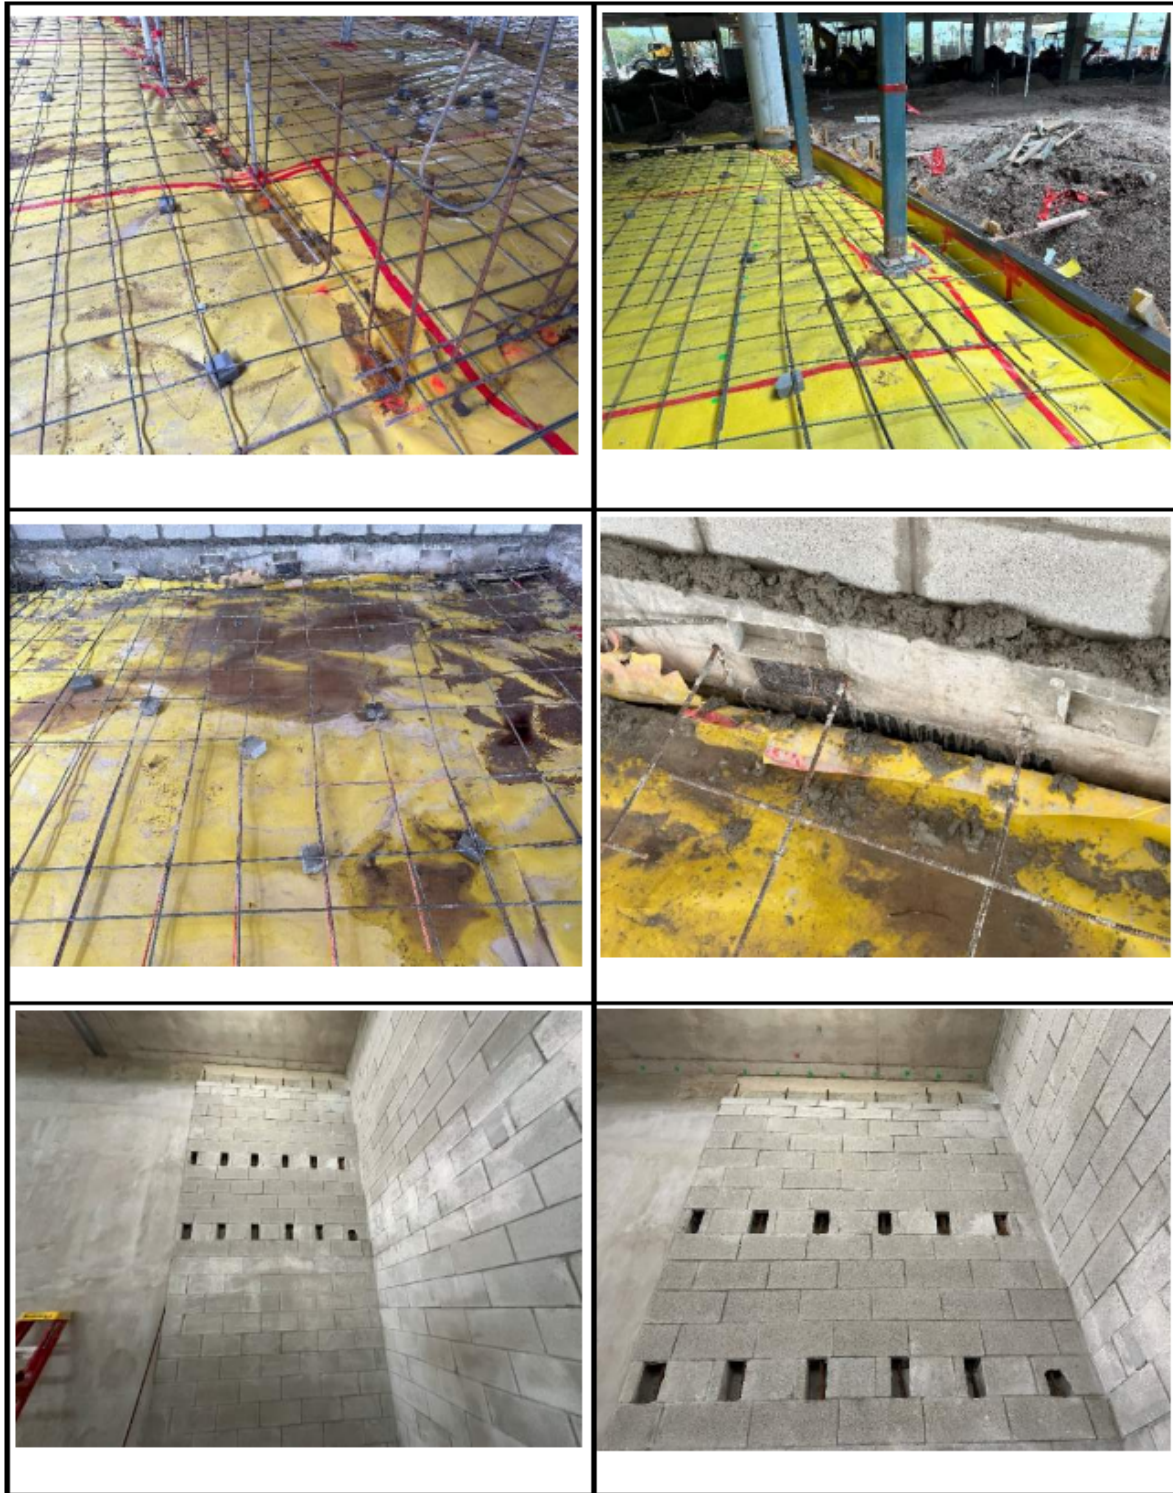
Photographs from Threshold Inspection Report No. 087 showing issue noted by inspector at thickened slab under CMU wall in upper left photograph and reinforcement not extending to the bottom of the slab above in the bottom two photographs
